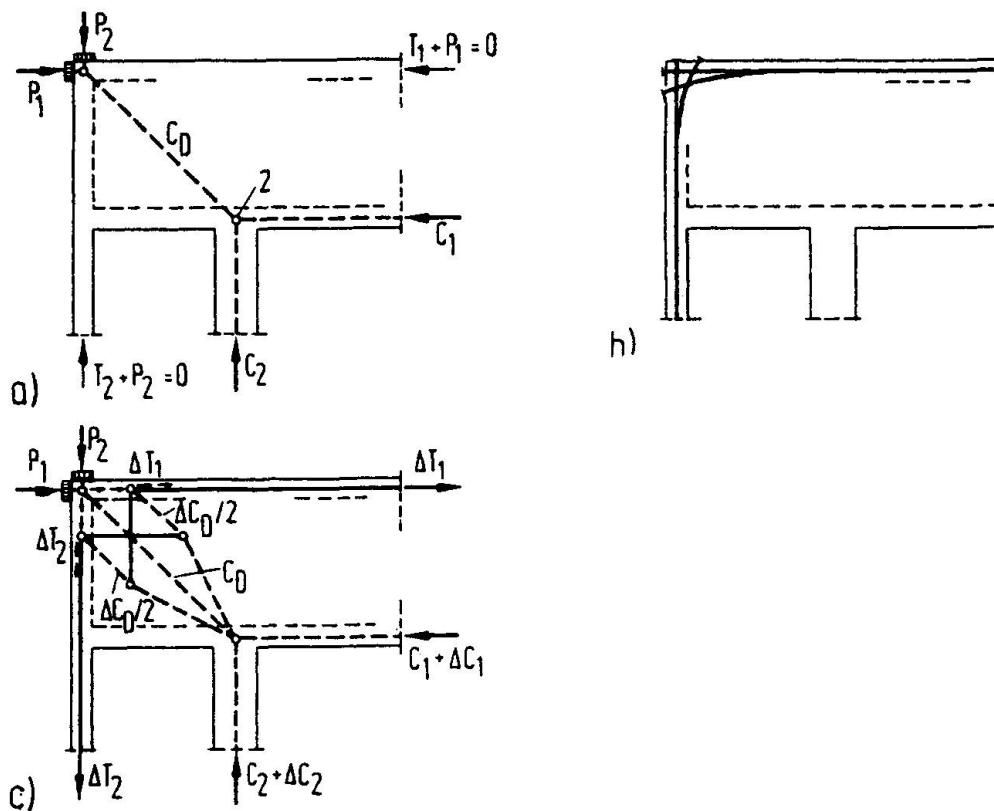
Prestressed structure without internal diaphragm wall a) Top slab and tension wall prestressed under dead load to give zero concrete stresses. Model showing the load paths. b) Practical reinforcement layout c) Strut-and-tie model for increased loads, prestress as before.
